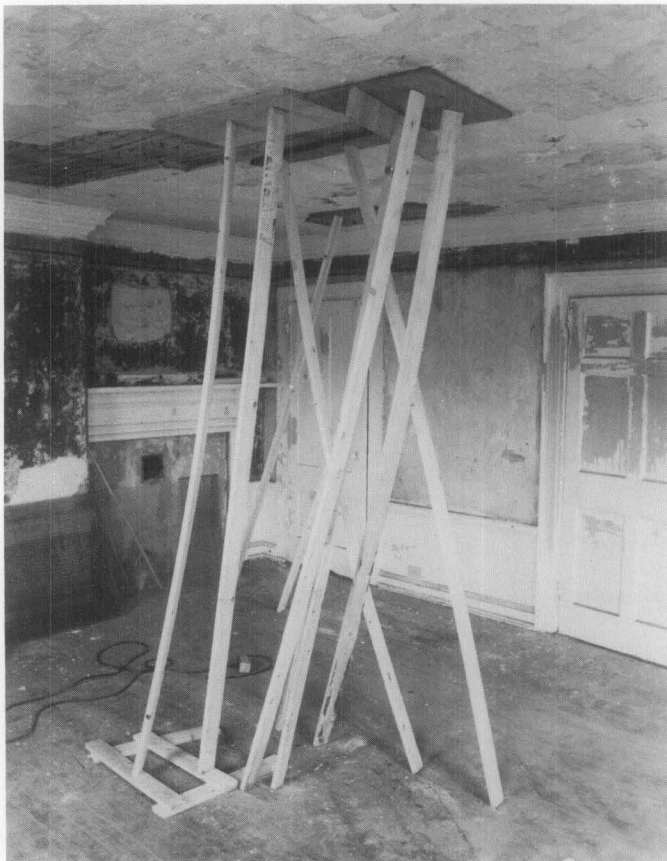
When ceiling repairs are made with wet plaster or with an injected adhesive mixture, the old loose plaster must be supported with a plywood brace until re-keying is complete. Photo: John Leeke.
